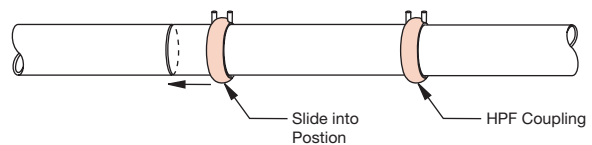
Slide second coupling into place and conduct first weld at joint seam
